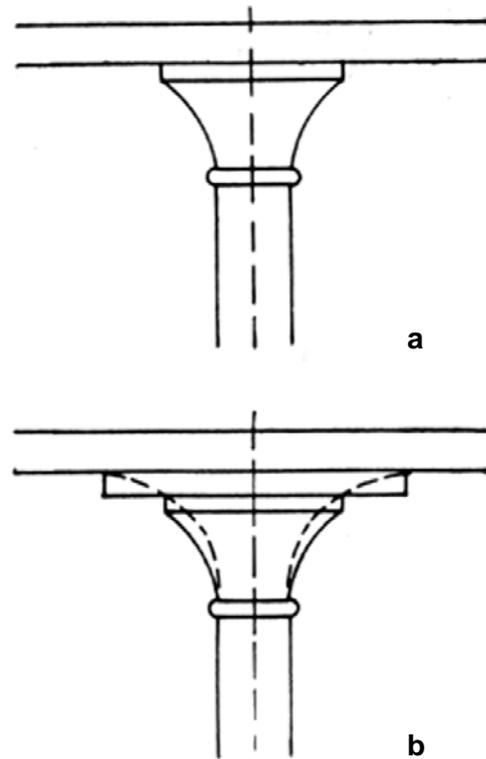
(a) Turner's original 'Doric style' mushroom column head design. (b) Turner's modified design incorporating a drop-panel. Dashed line shows improved design proposed by Maillart. (Bill)
